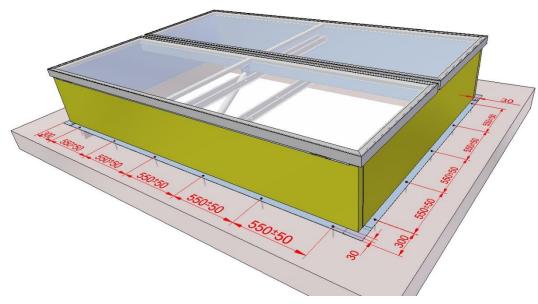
Method of mounting the mcr PROLIGHT DVP smoke vent on the roof – spacing of connectors.
